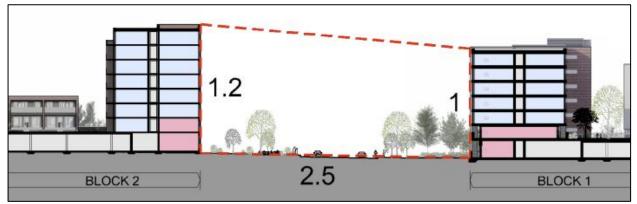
| Section of Belcamp Parkway Between Blocks 1 and 2
